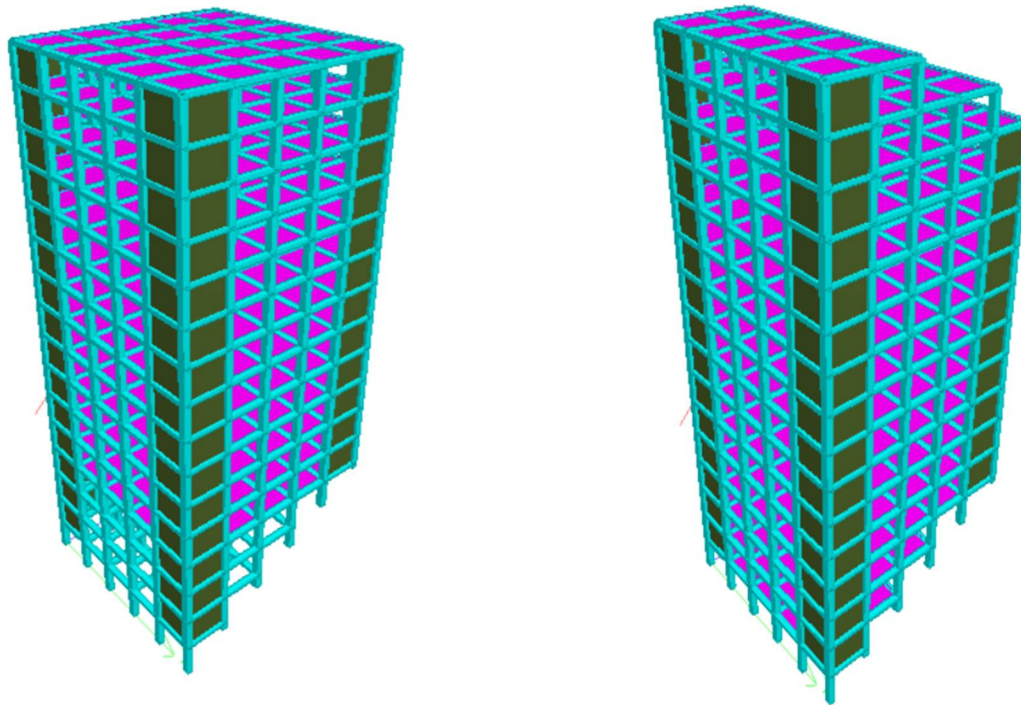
3D View of C1 and C2 building with shear wall at corner
